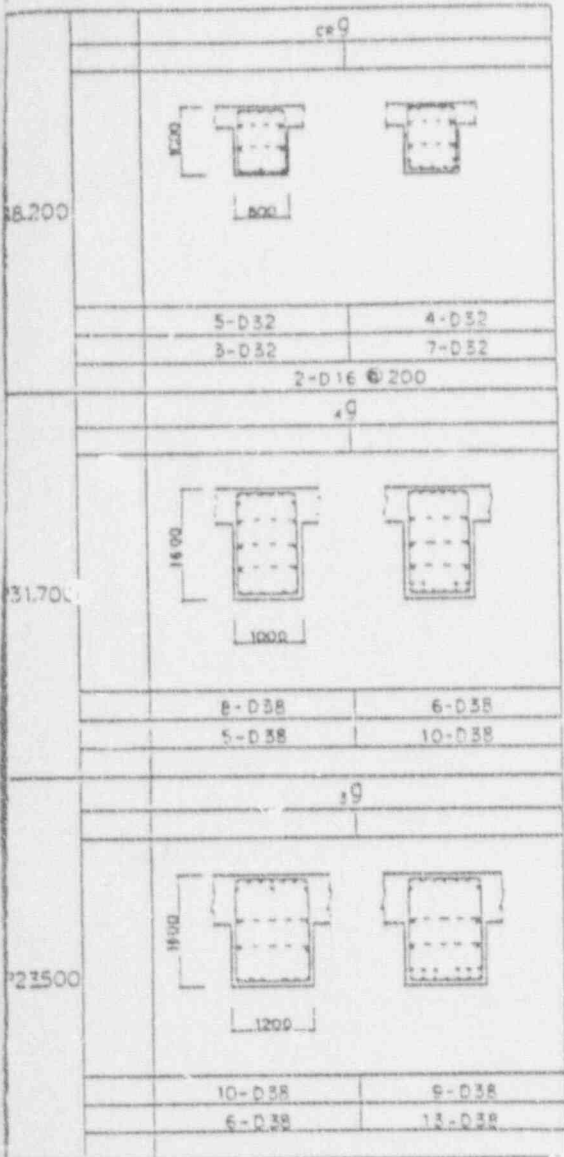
H.3-8 LIST OF SEISMIC WALL SECTIONS
